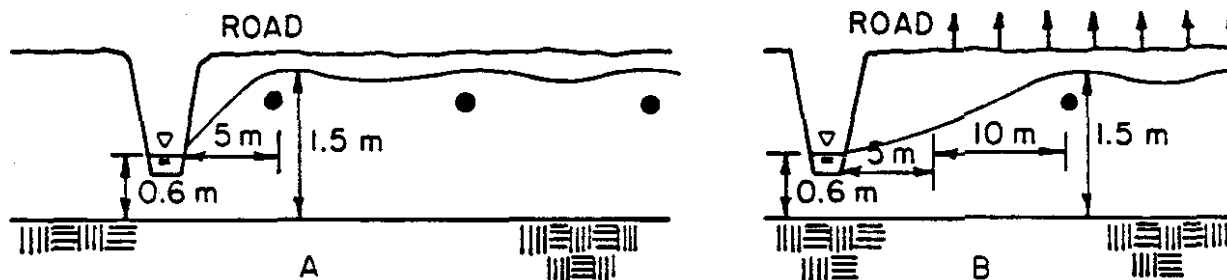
Seepage along Boundary A-B: (a) the first drain tube is located immediately adjacent to the field access road 5 m from the drainage ditch, and (b) the drain tube is located 10 m back from the road.
